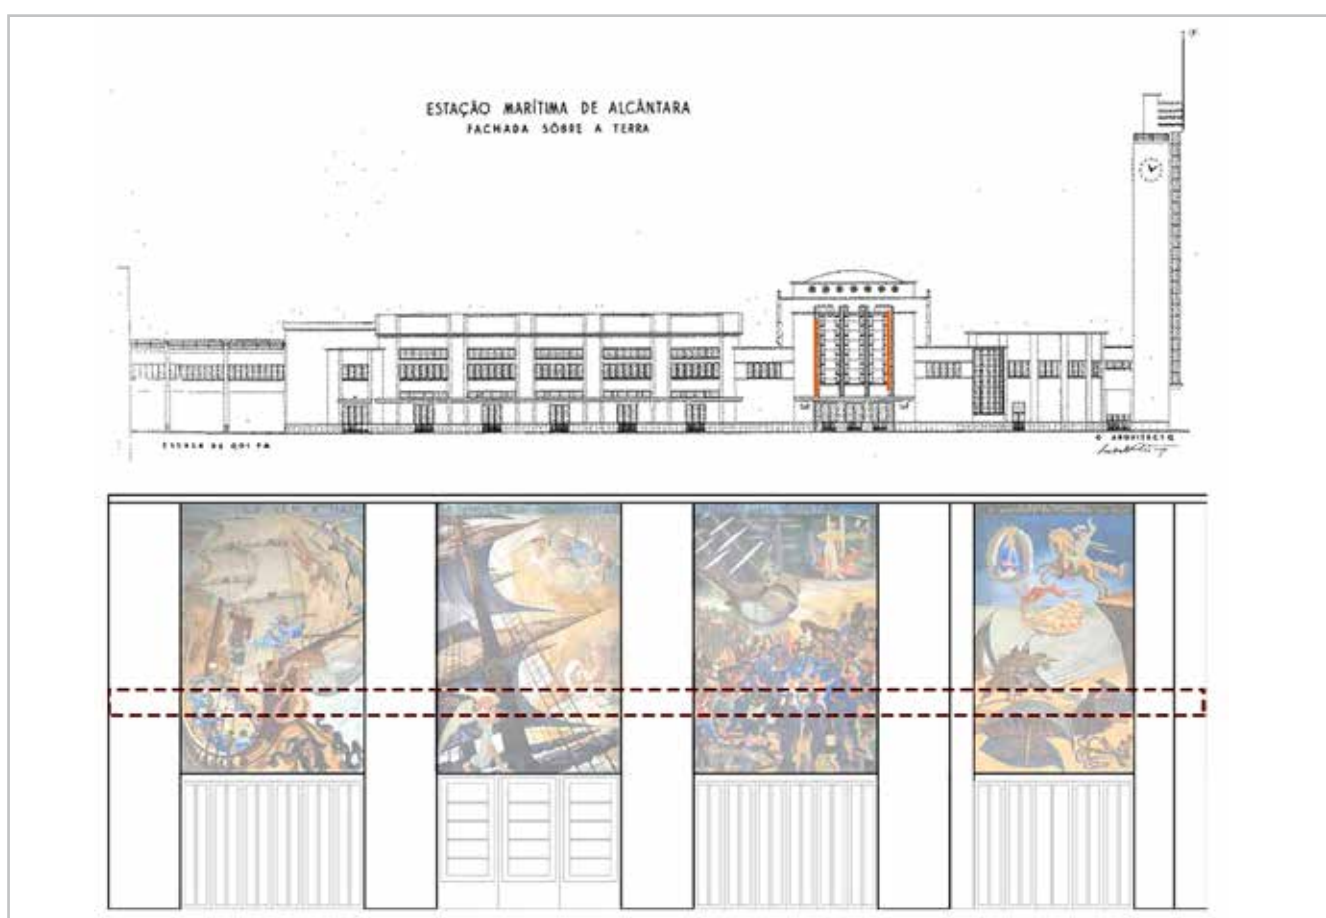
On top, cross section of Alcântara station with marked positions of the murals. Source of the section (Monteiro 2012); on the bottom, scheme of the west wall with the display of the murals and indicated position of thermal bridge that corresponds with construction joint between two floors. Drawing by Mila Cvetković 2020.
